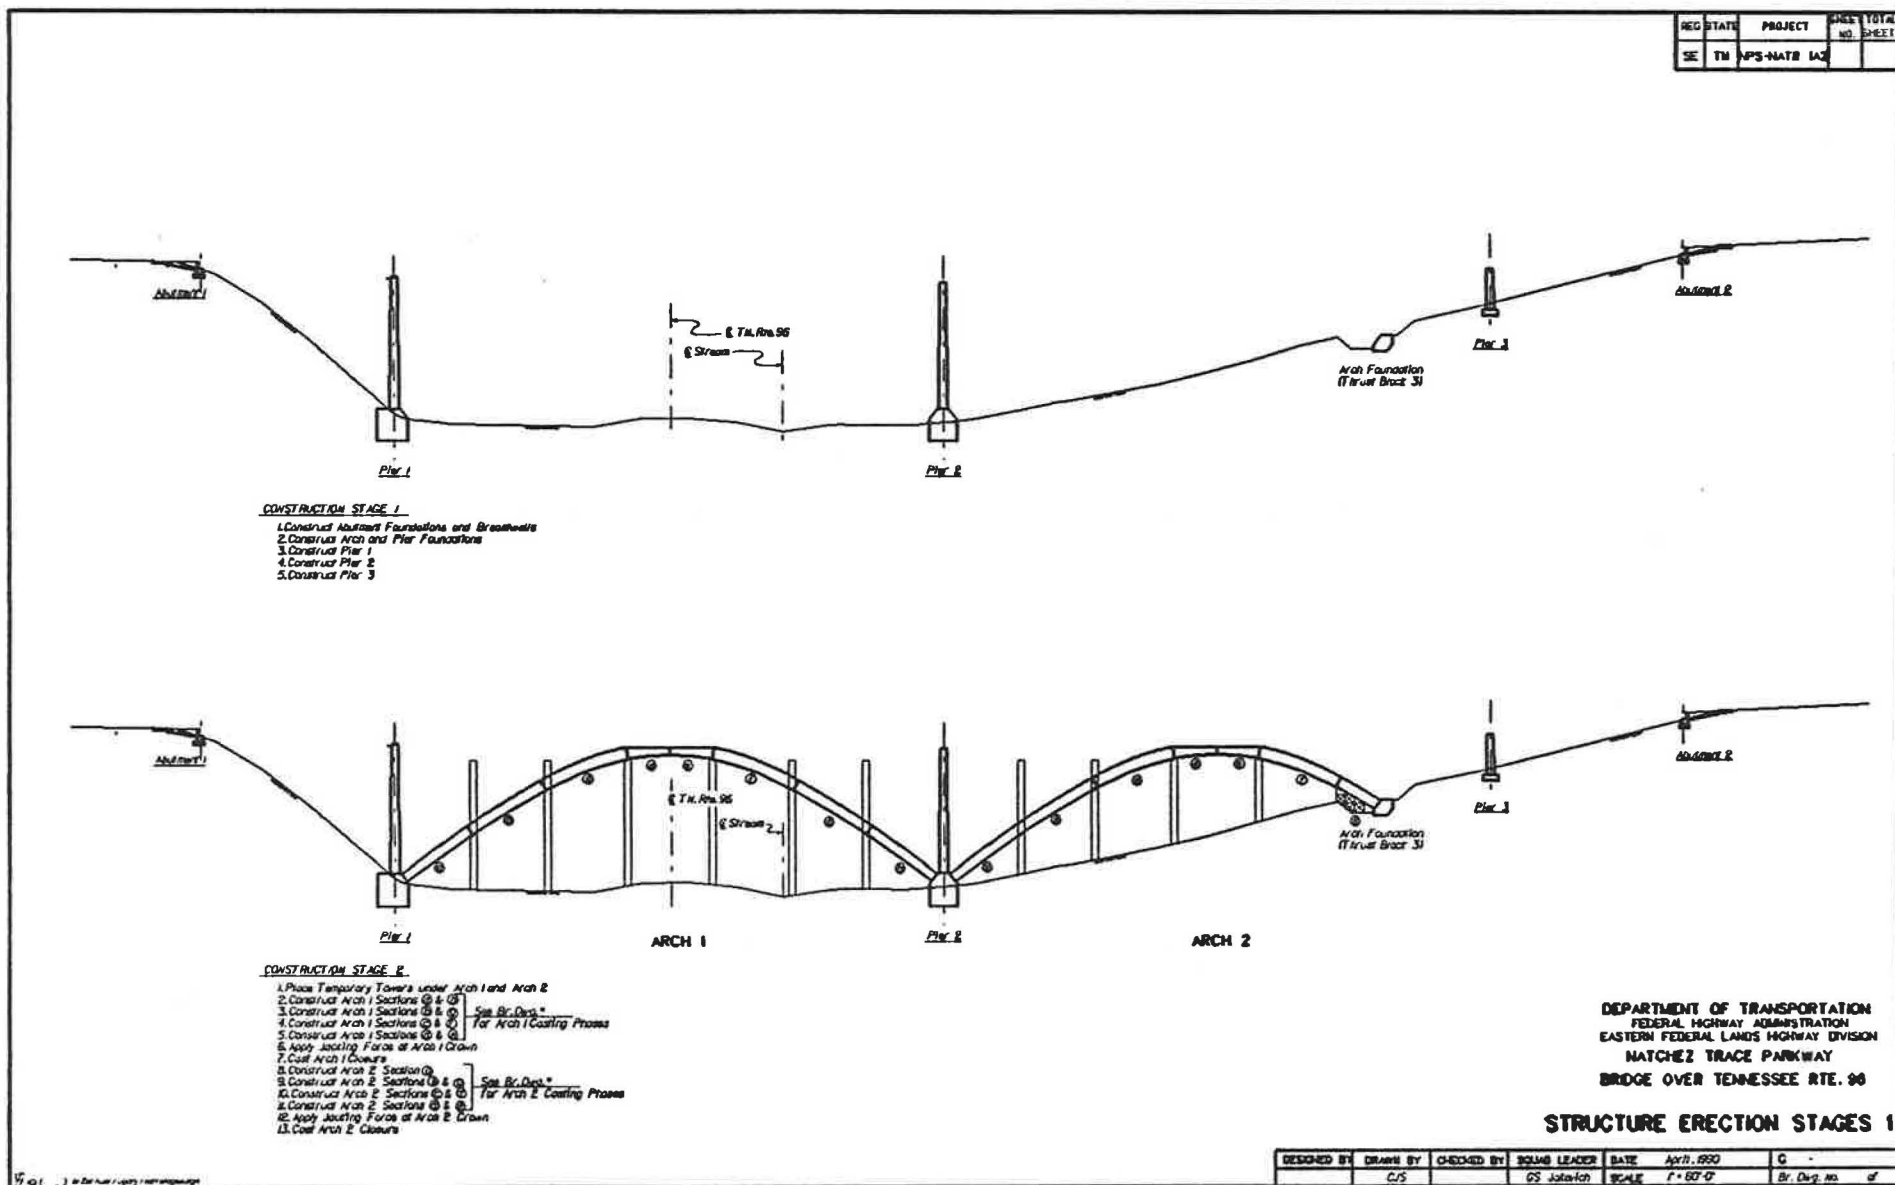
Construction stages 1 and 2 showing substructure construction
